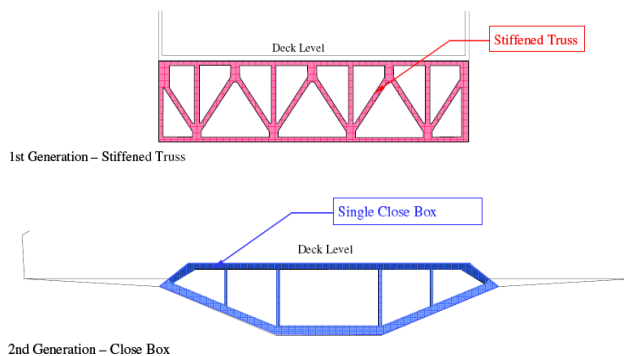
Typical sections of 1st and 2nd generation of bridge deck
